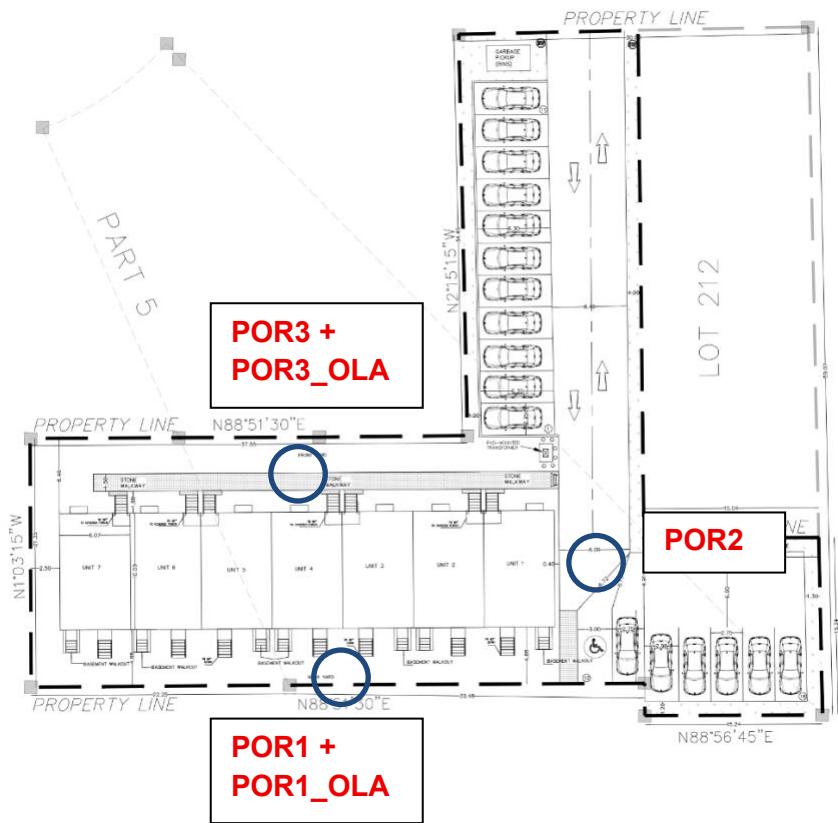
Site Plan showing Conceptual Acoustic Fence
